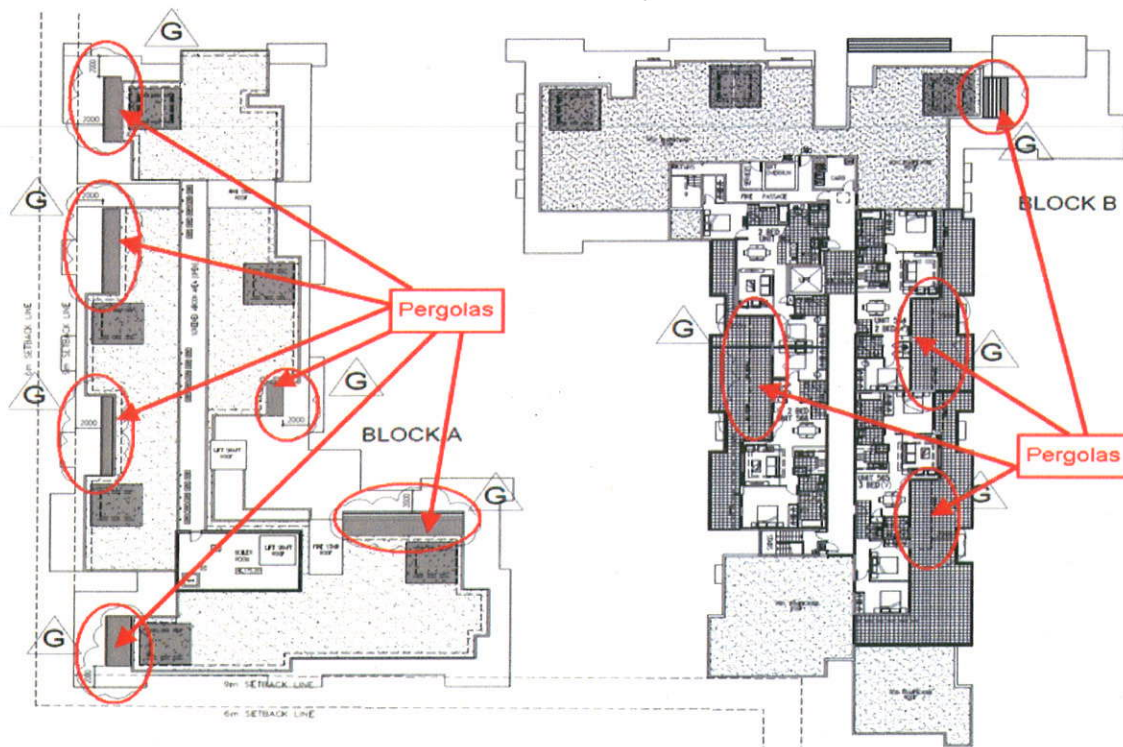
Proposed pergolas for Level 5, Block A & B (Stage 2, Level 5 Plan)
